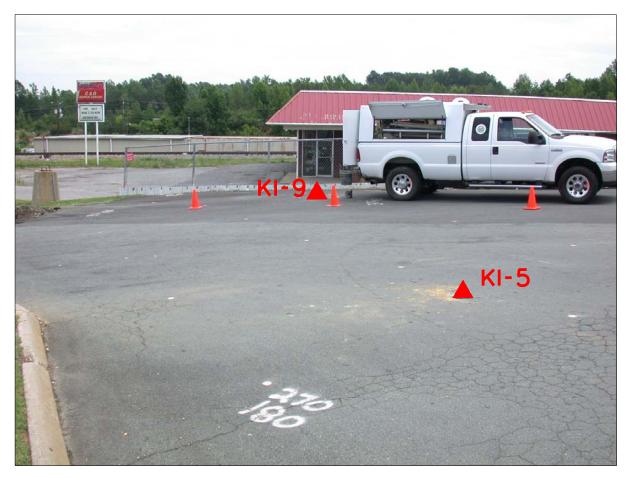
BORINGS ON KING PROPRTY LOOKING WEST FROM THE STREET
